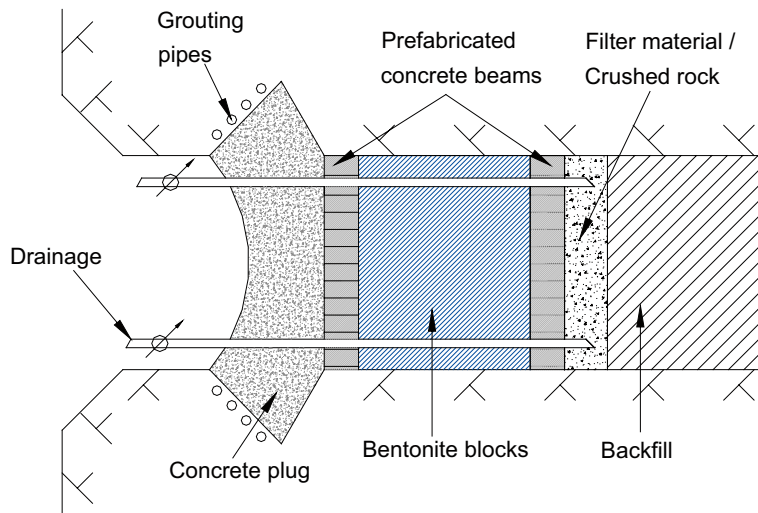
Concrete Arch – Bentonite Block Concept (CABB).
